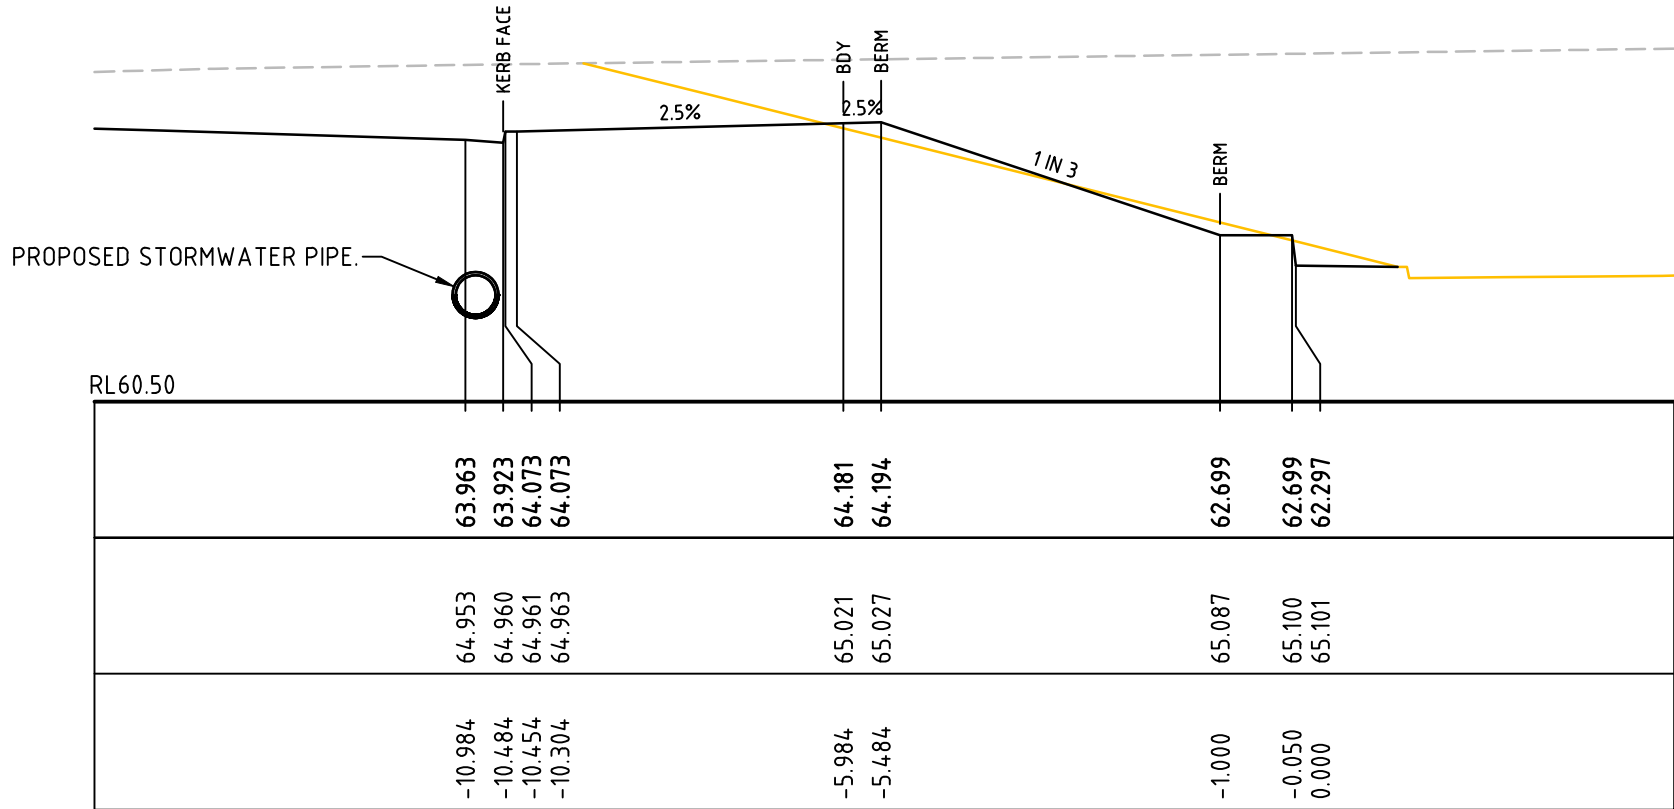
C3083 Project No. 15-272 Issue A1
